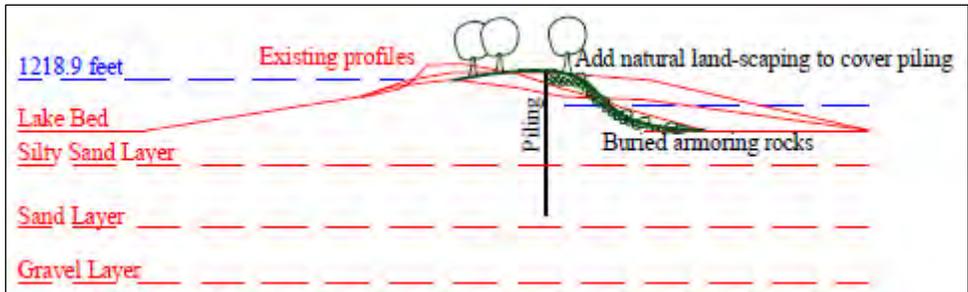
Cross Section of Proposed Sheet Pile Core Wall
